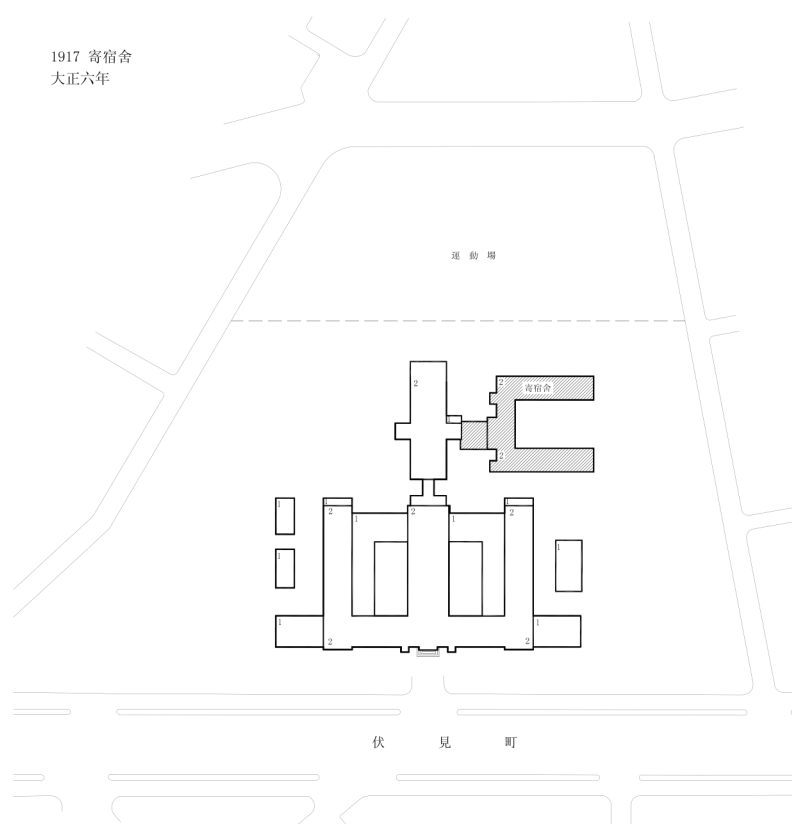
The Floor Plan of Nanyuan Campus Building
